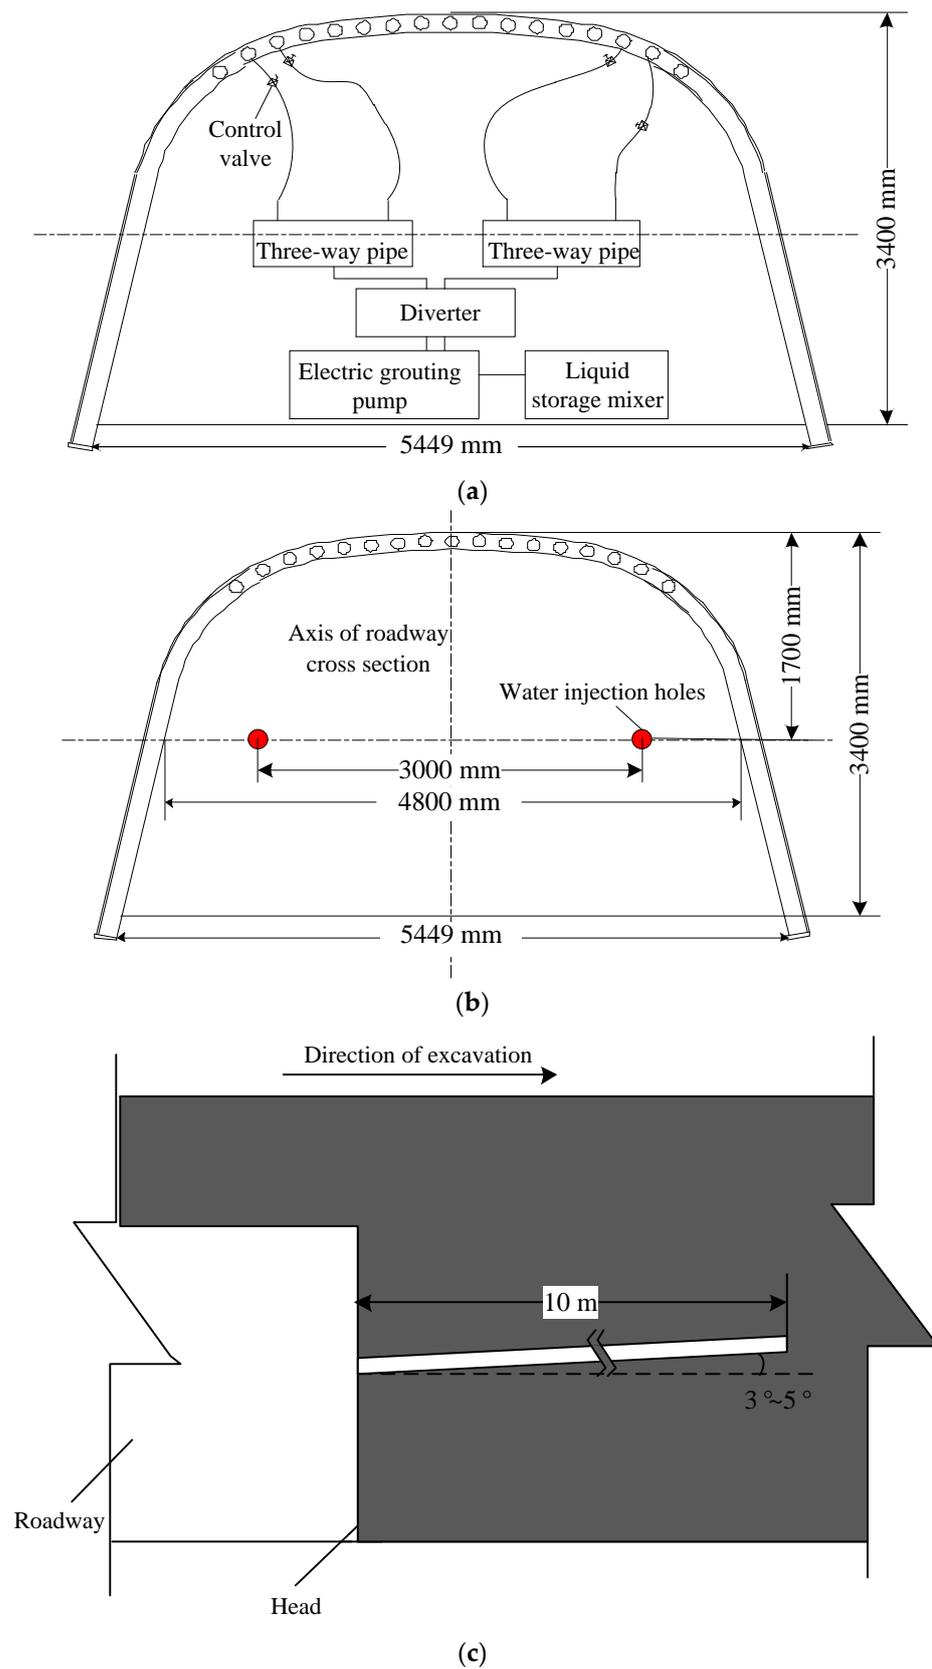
Layout of advance water injection and grouting in the roadway. (a) Layout of roadway advance grouting. (b) Section of the layout of advance water injection. (c) Cross section of the layout for the advance water injection.
